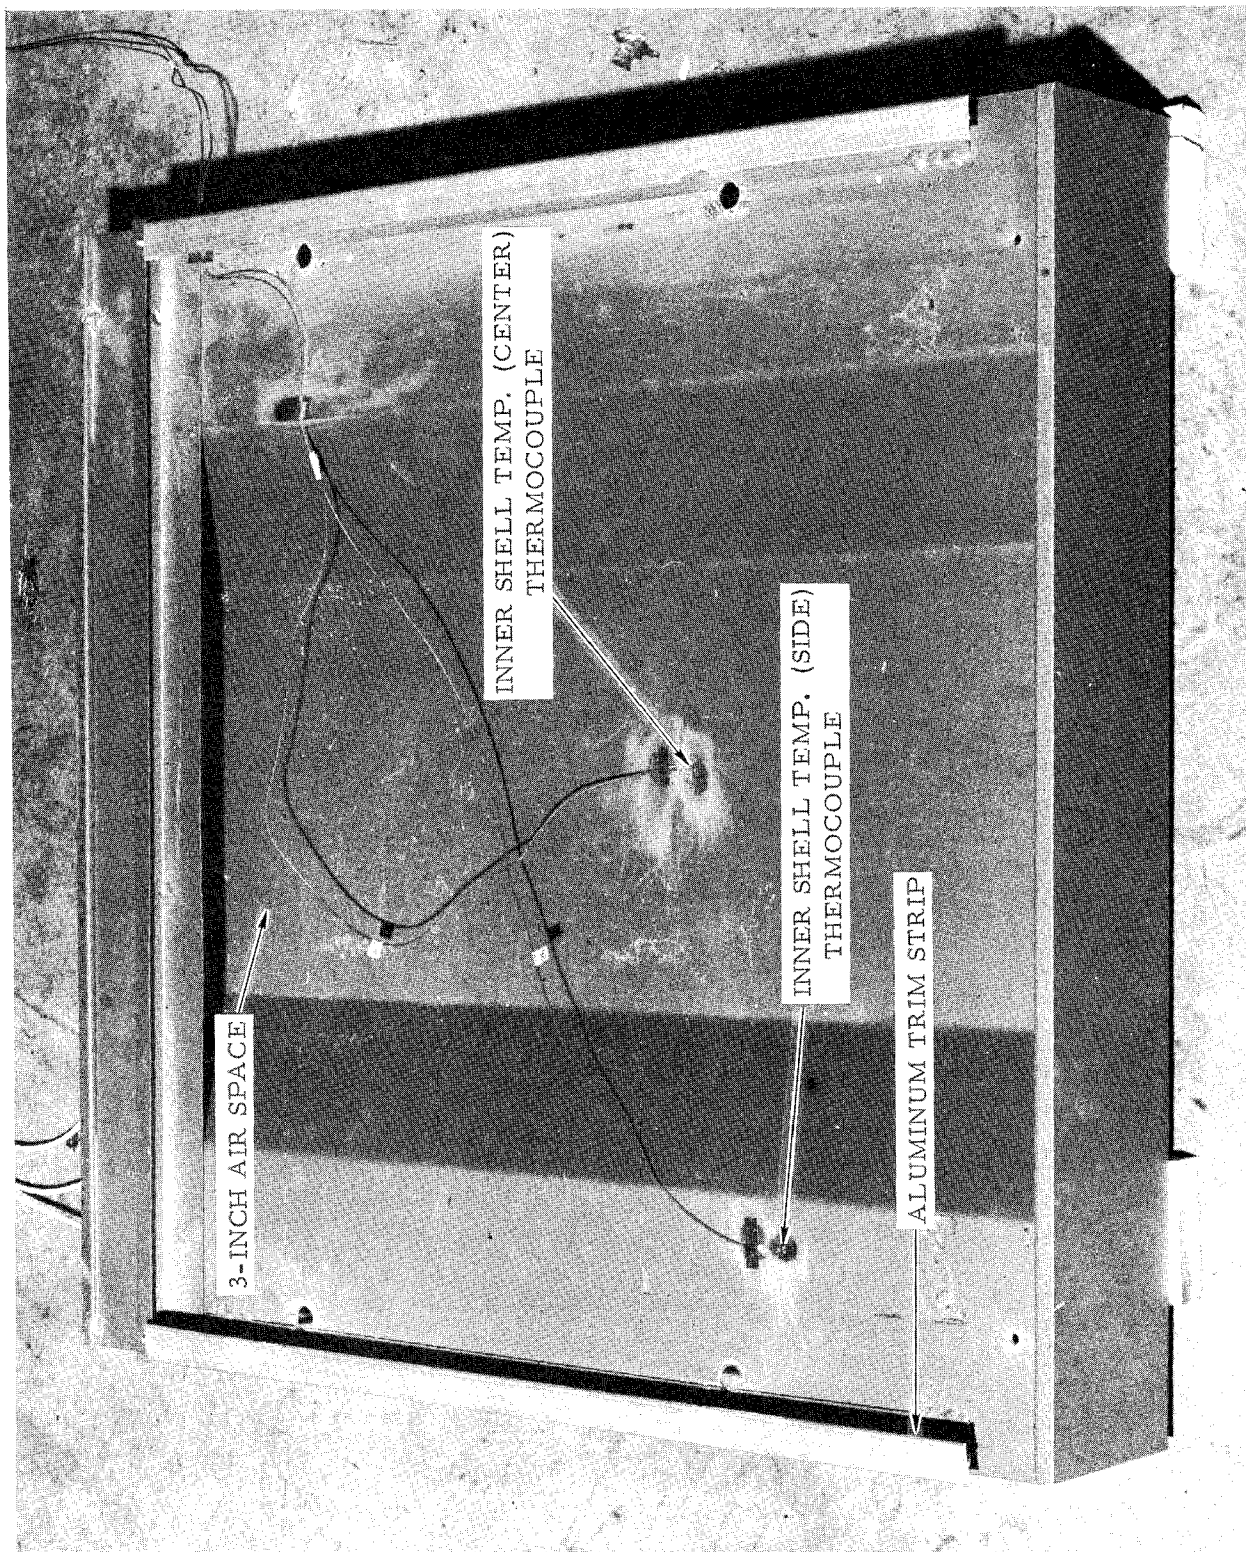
PANEL NO. 1 - WALL SECTION WITH INTERIOR
